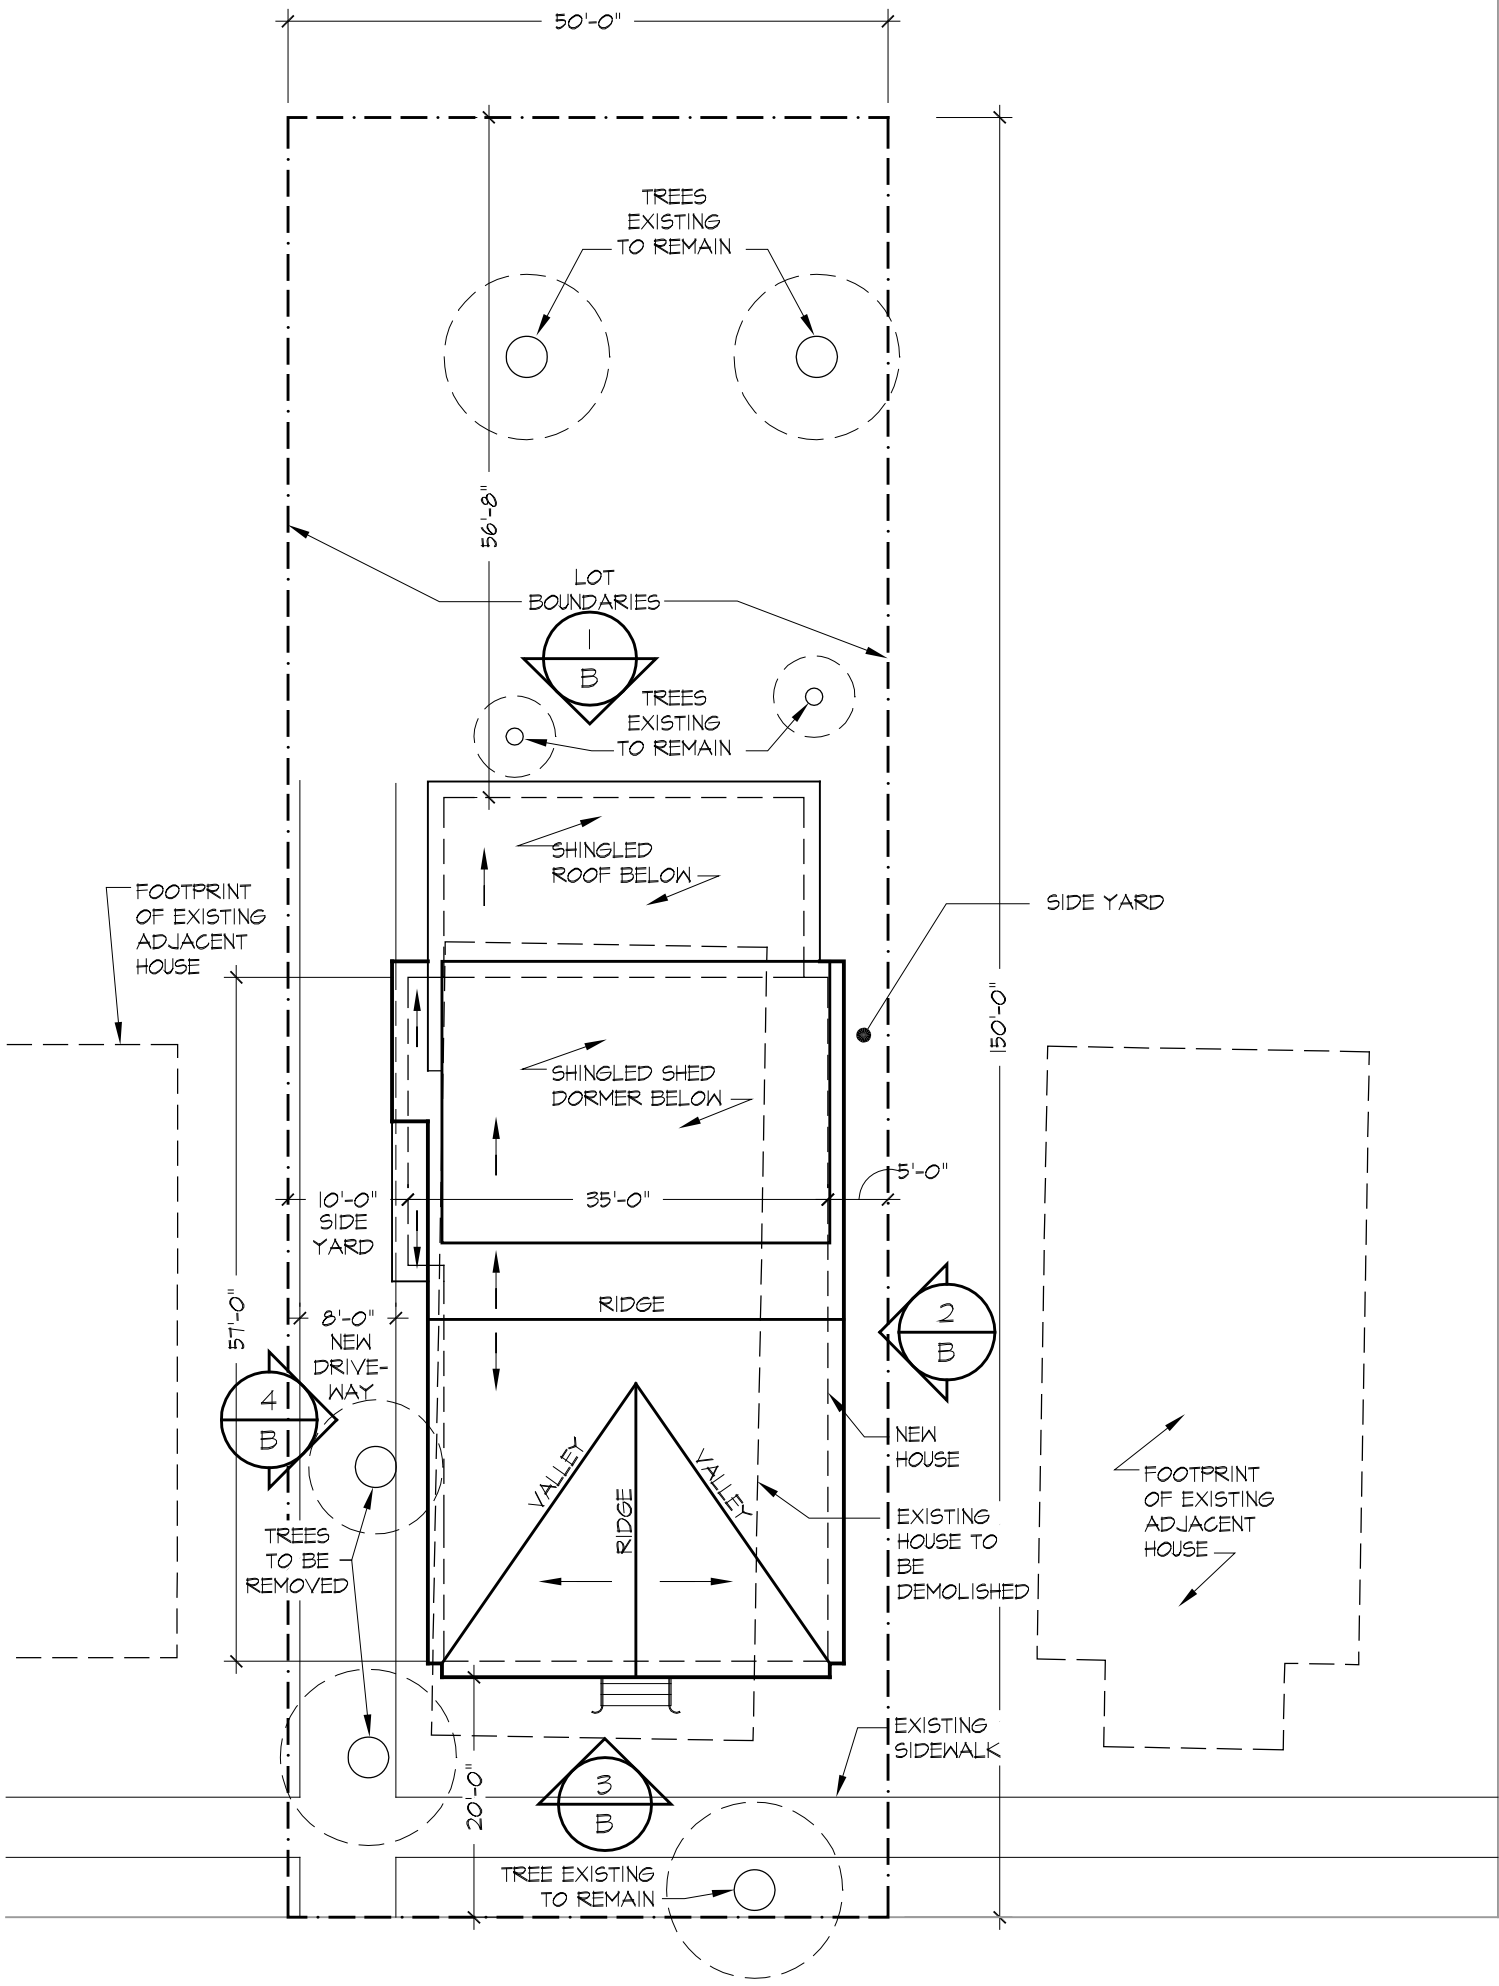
DETAILS OF PROPOSED PROJECT: (TO REPLACE A HOUSE PREVIOUSLY PLANNED TO BE DEMOLISHED DUE TO MAJOR FOUNDATION ISSUES - 1 YEAR UP IN MARCH)
